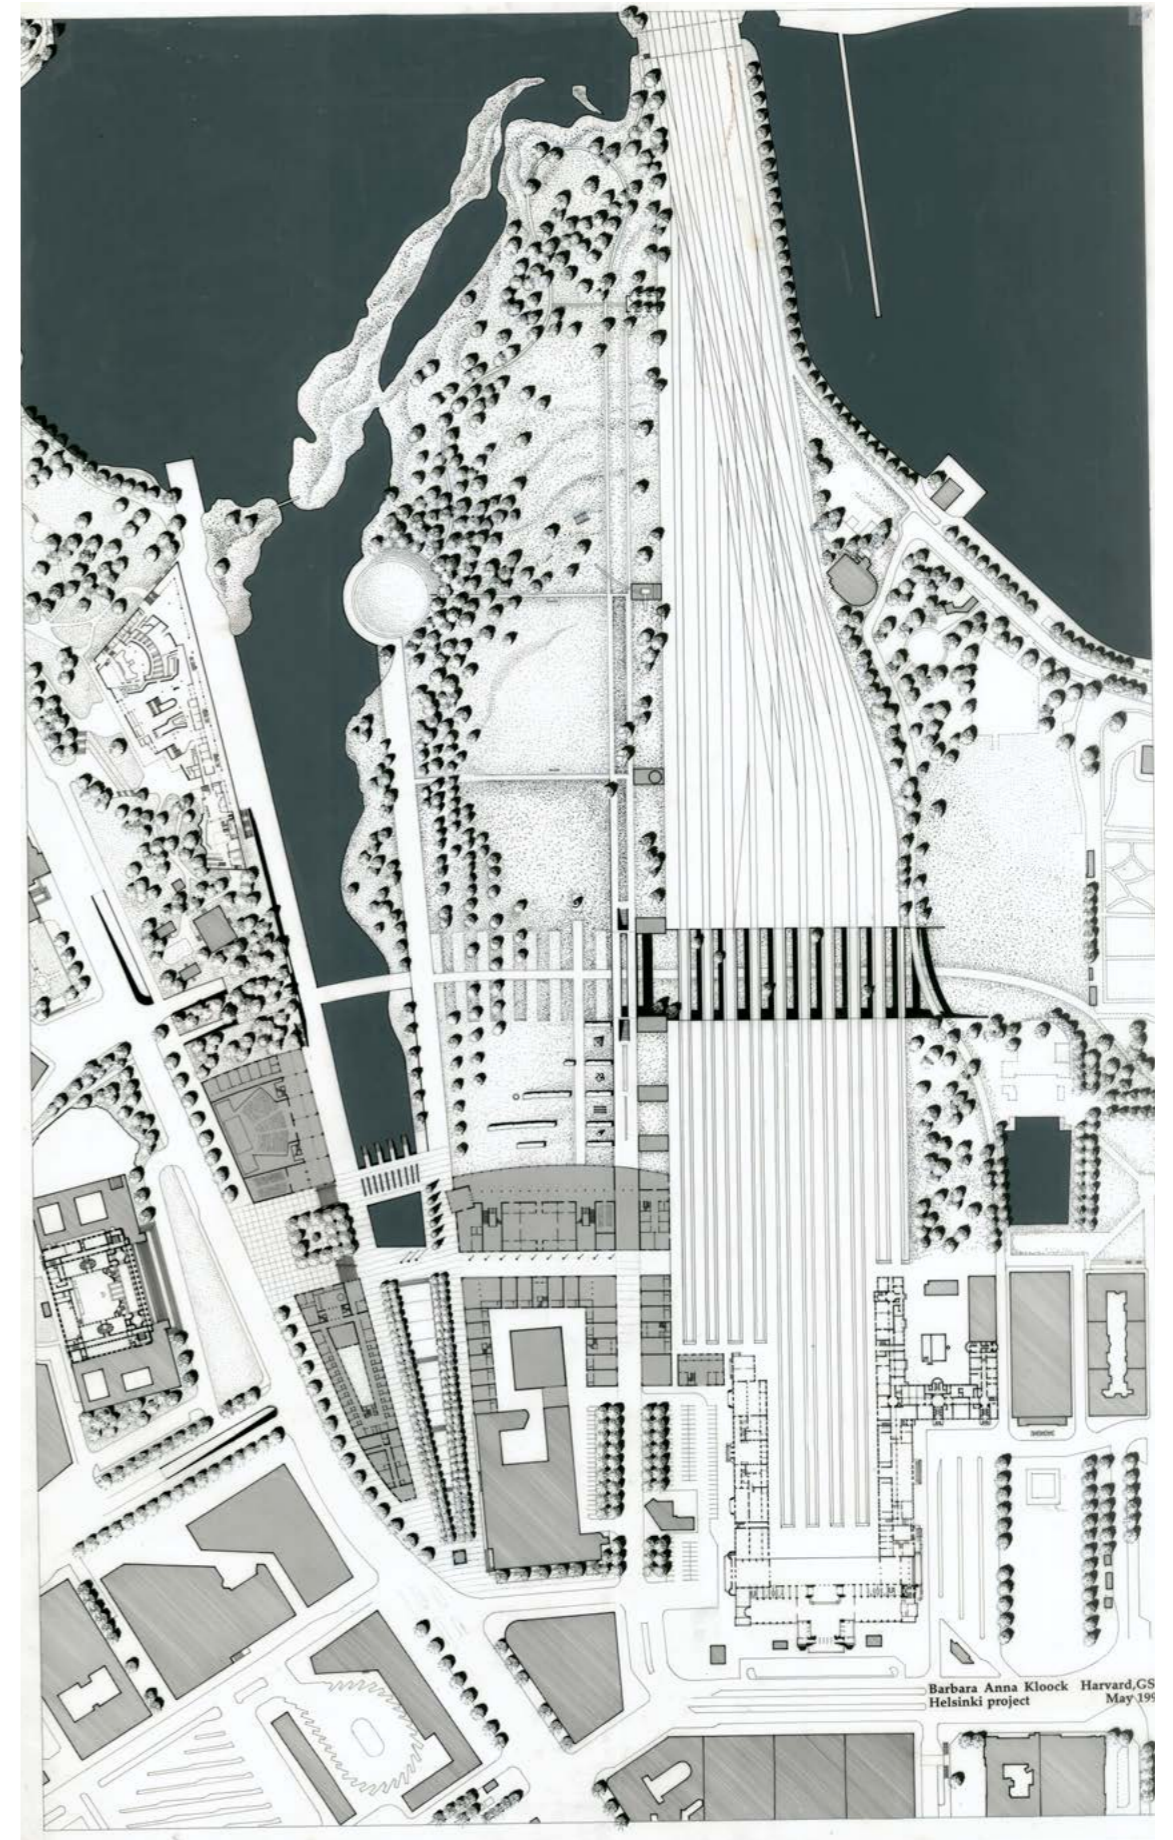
Plan of the proposed urban intervention and new city park around the central train station of Helsinki, final studio project, Barbara Aronson, 1991
